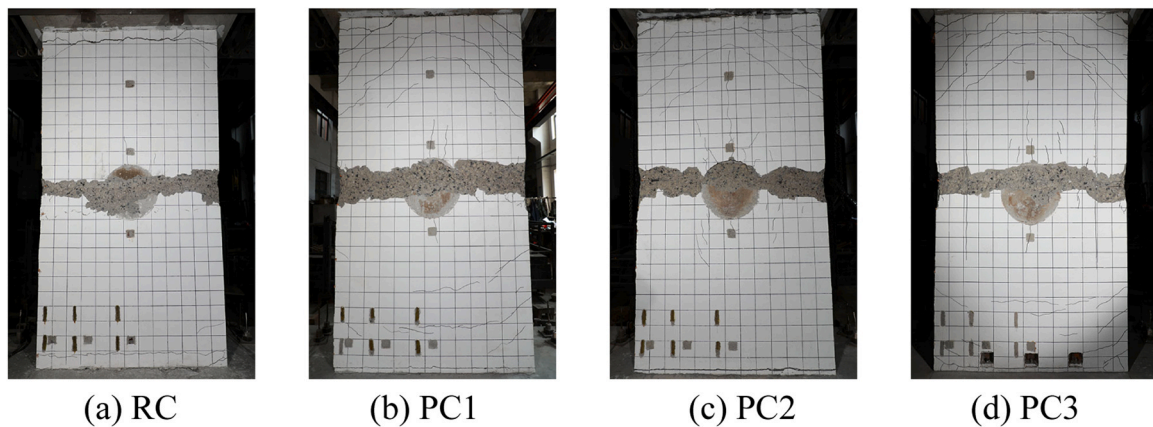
Failure modes of shear walls on the impact-facing side.
